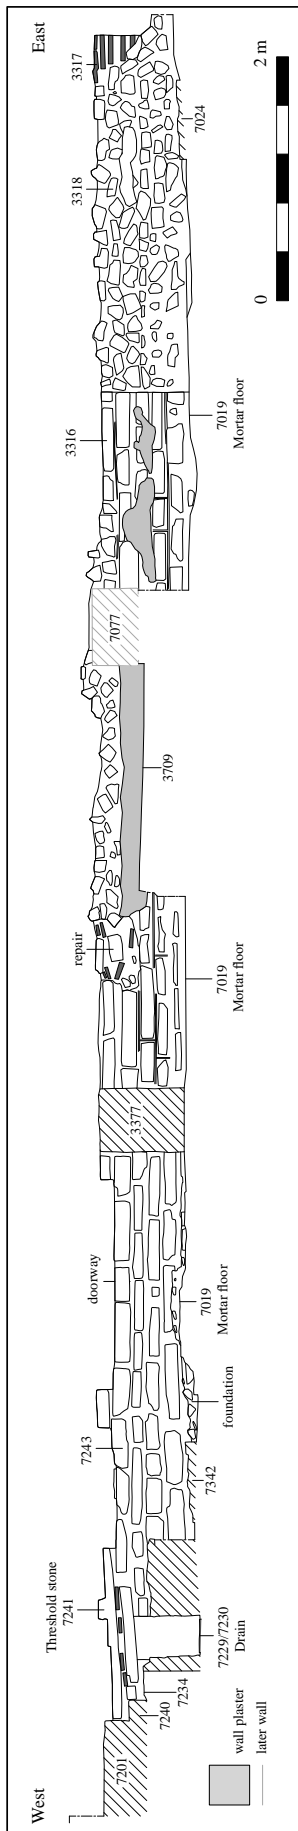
South-facing elevation of the rear wall of the north portico showing walls 3316/7243 and 3318
